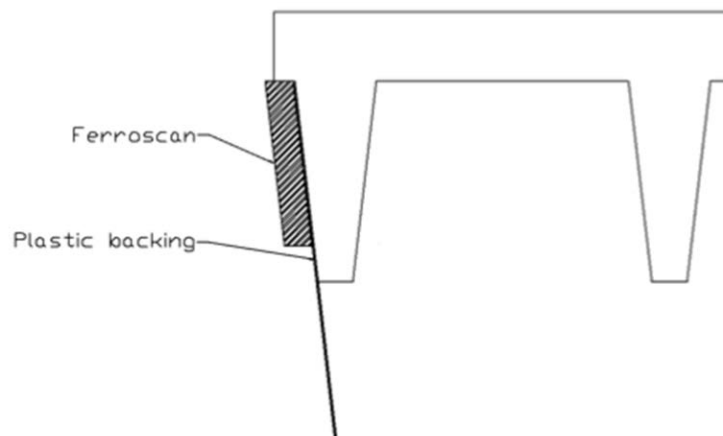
Typical Ferroskan measurement setup for double T-beam bridges.
